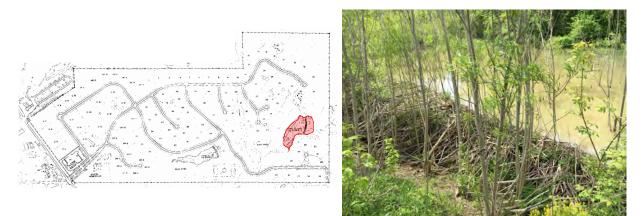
Scenic Meadows subdivision site plan depicting the proposed Hughlett Branch detention basin on the right side of the development, and the beaver dam located upstream of the proposed detention site
